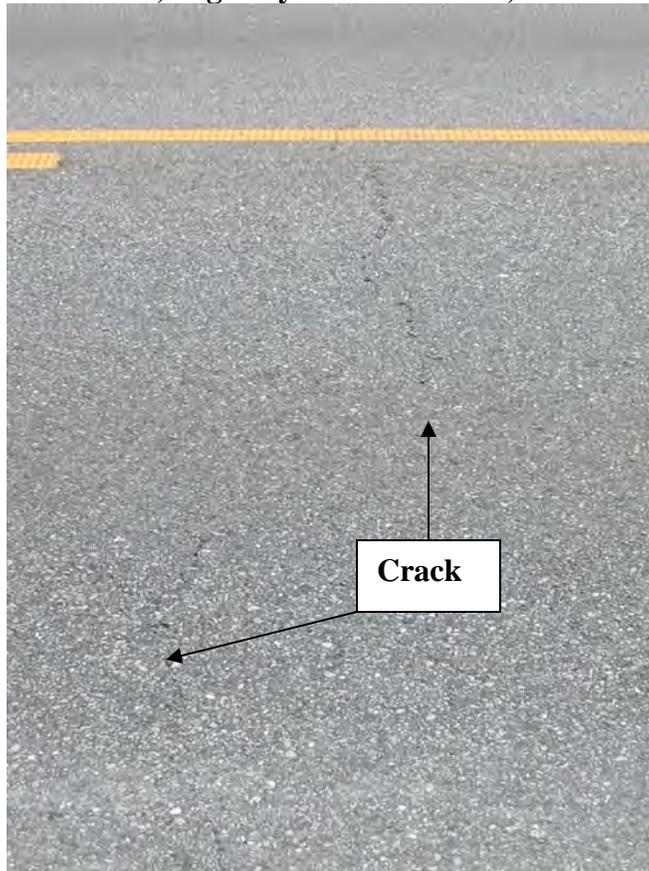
Transverse Reflective Crack, AL-4 Highway 84 Monroeville, AL
